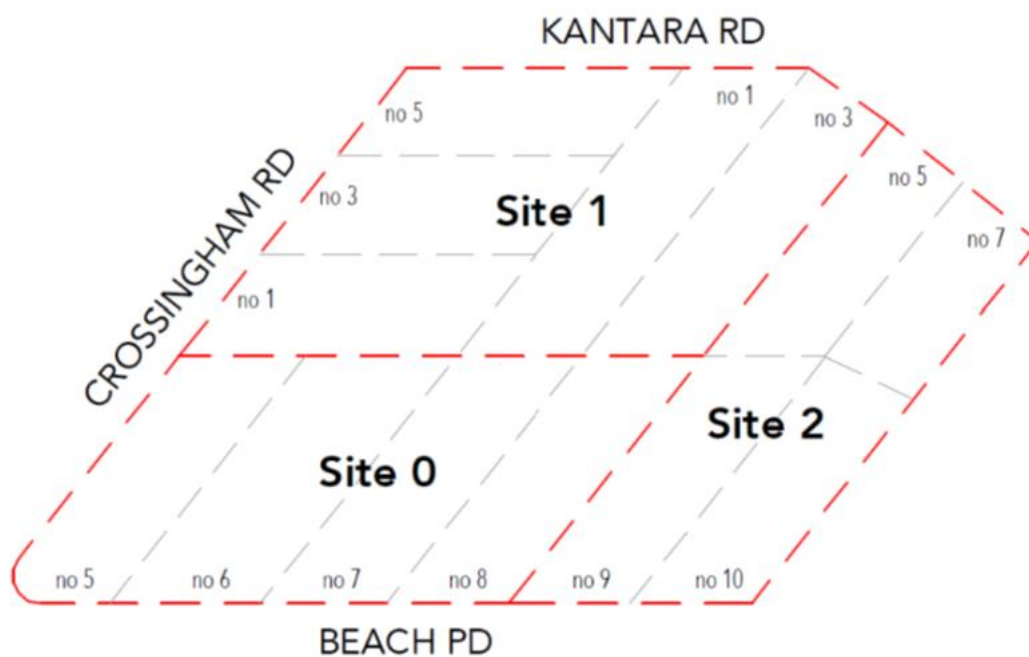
Site plan of proposed development site amalgamation of the subject site (Site and Site 2) and Site 0 (5-8 Beach Parade) (Source: Think Planners)
